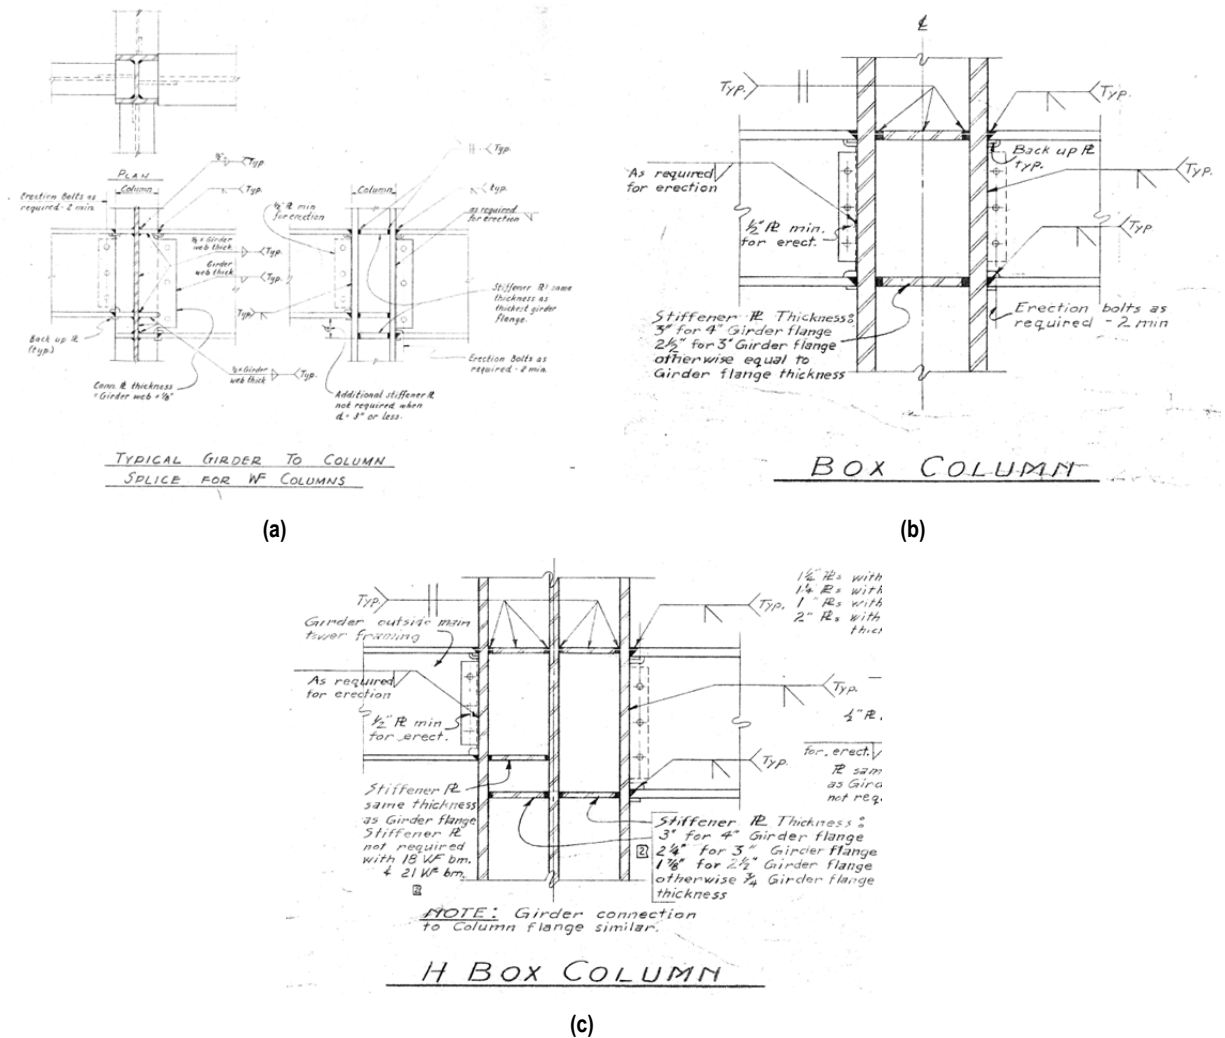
Typical connection details: (a) girder to wide-flange column connection details; (b) girder to box column connection details; and (c) girder to H-box two-cell) column connection details.
